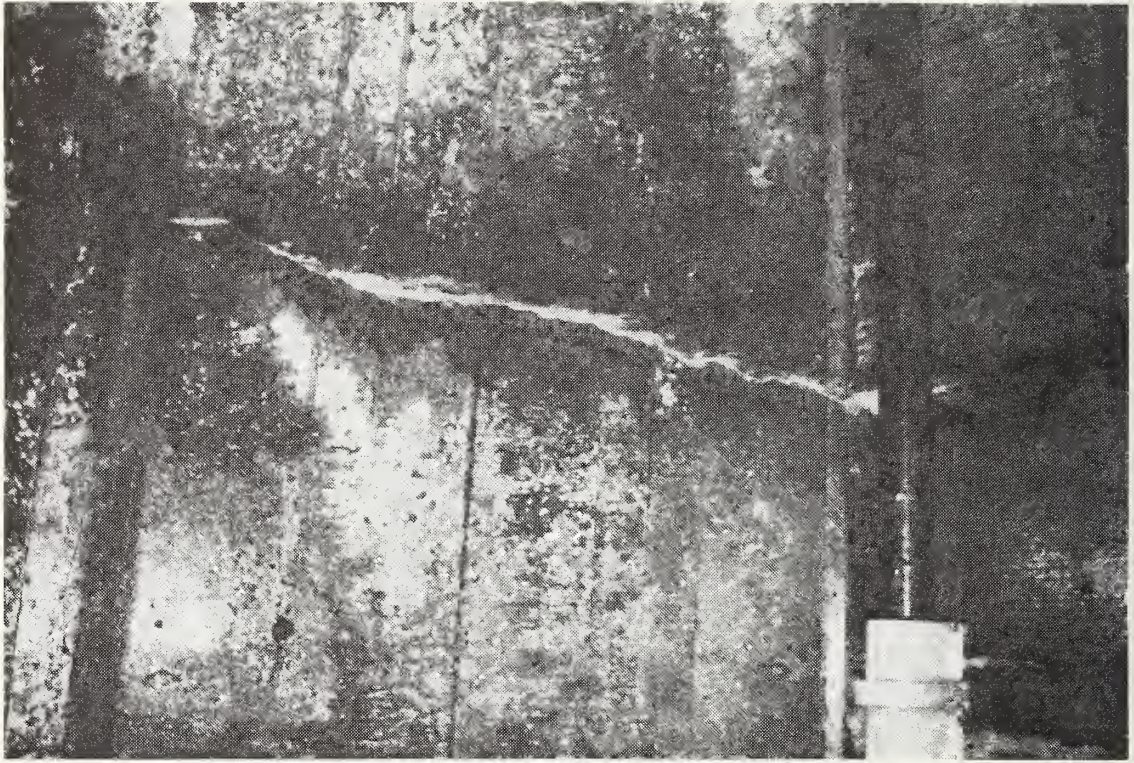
SHRINKAGE CRACKS (ROUTE 131-A)
